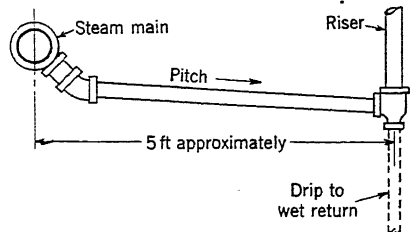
TYPICAL STEAM RUNOUT WHERE RISERS ARE DRIPPED
